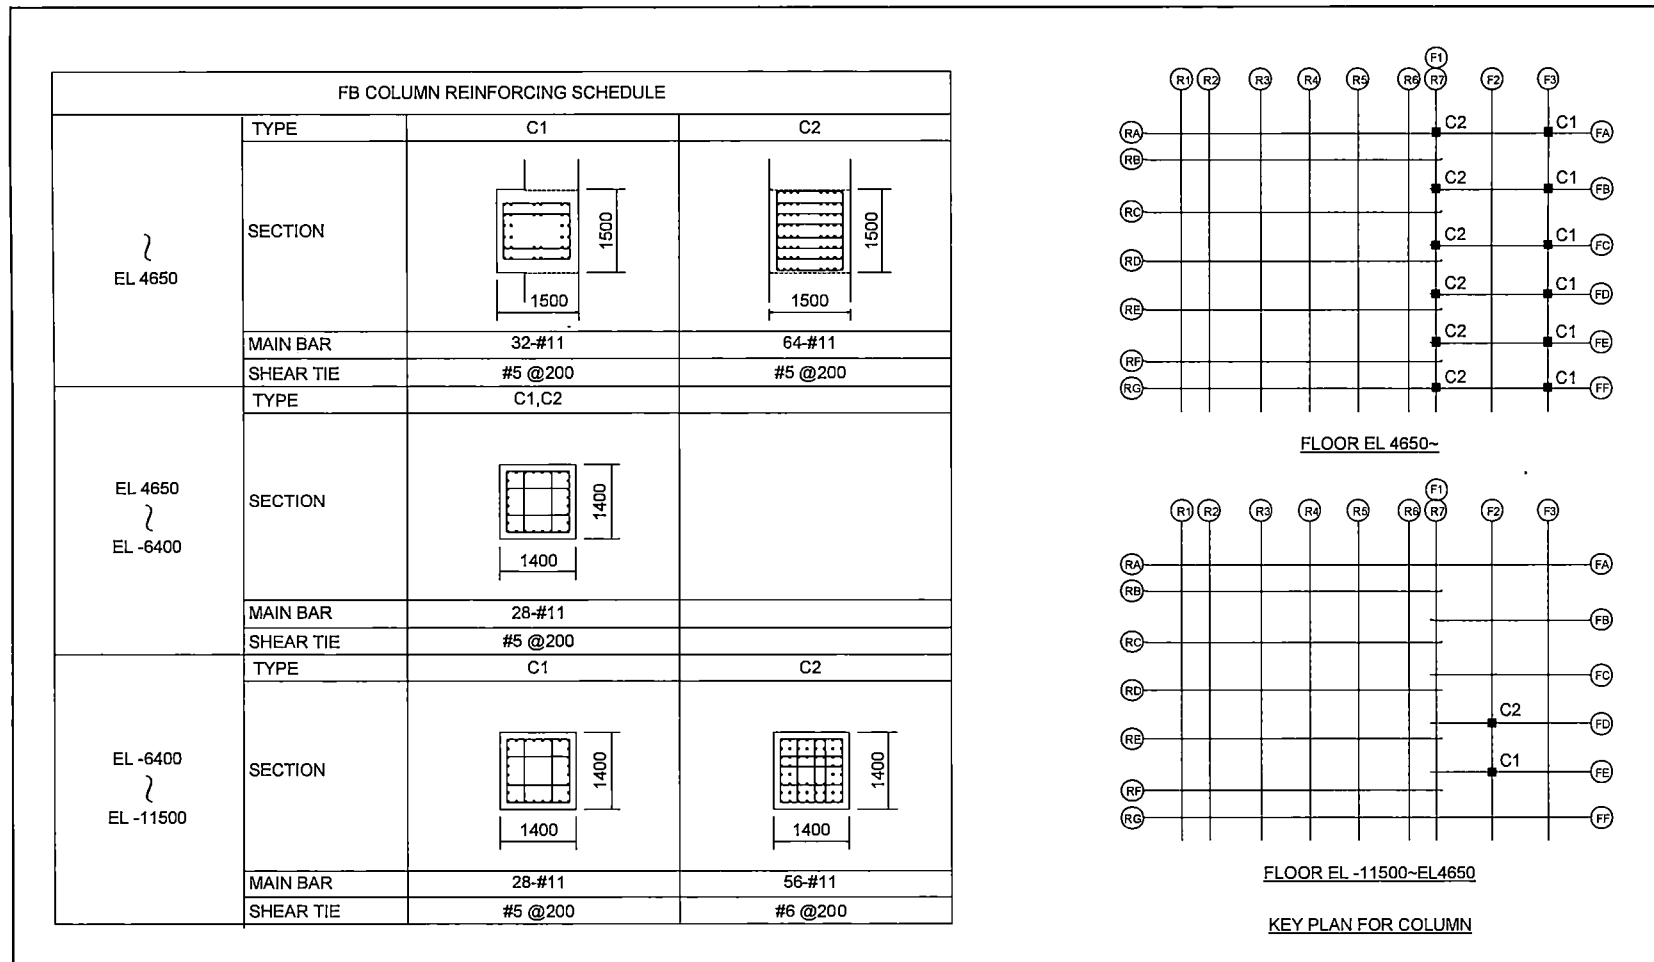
FB Reinforced Concrete Column Reinforcing Schedule
